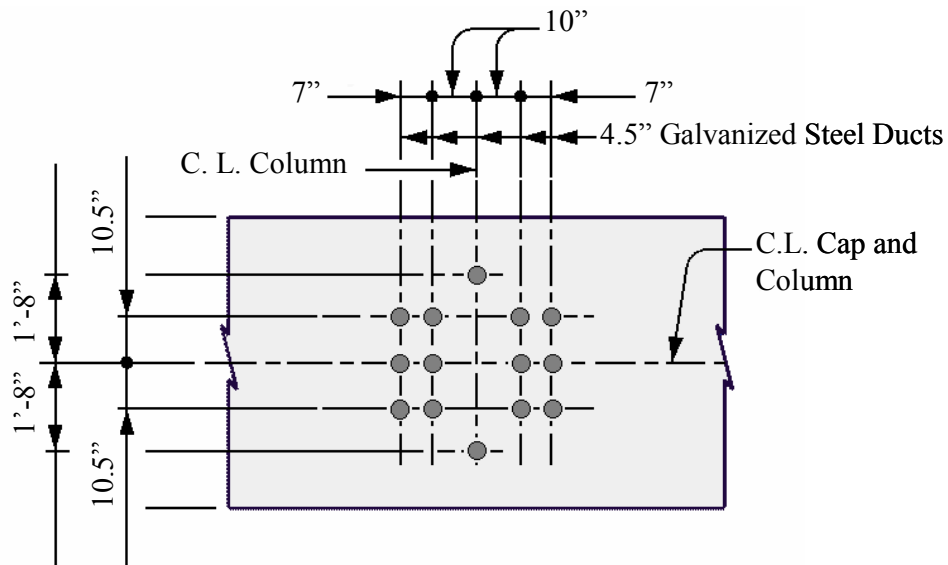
Bent Cap Connection Zone Detail (Hyzak 2003)
